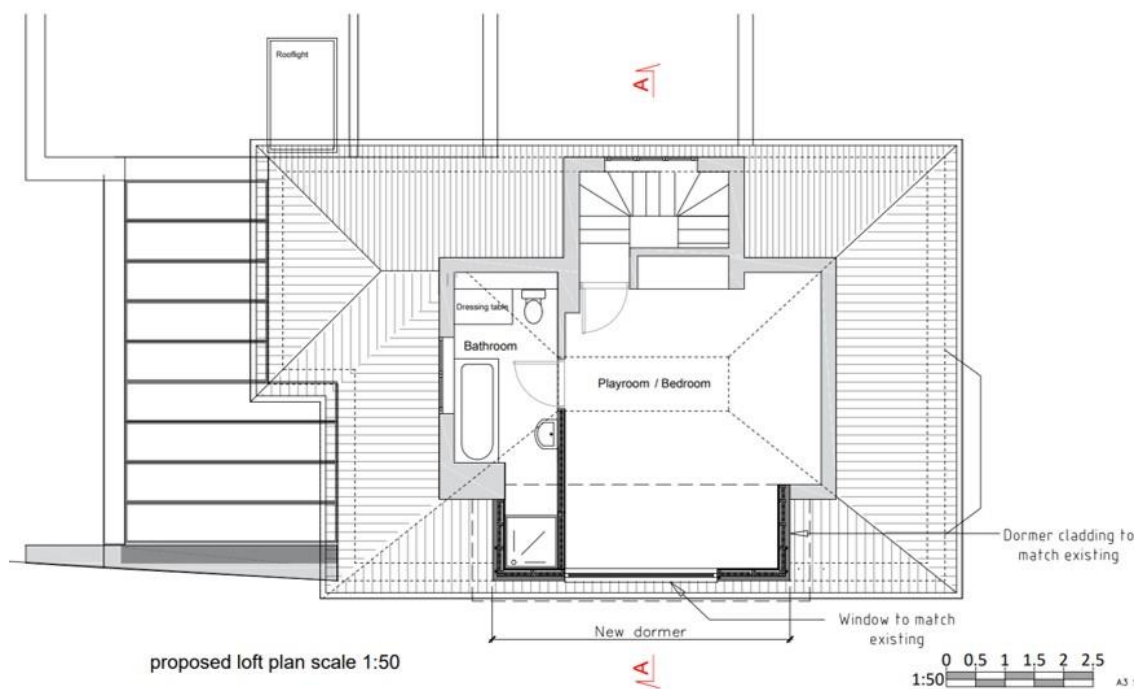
The proposals will be contained to the second floor of the dwelling and provide for additional residential living space, within the existing footprint of the building.
